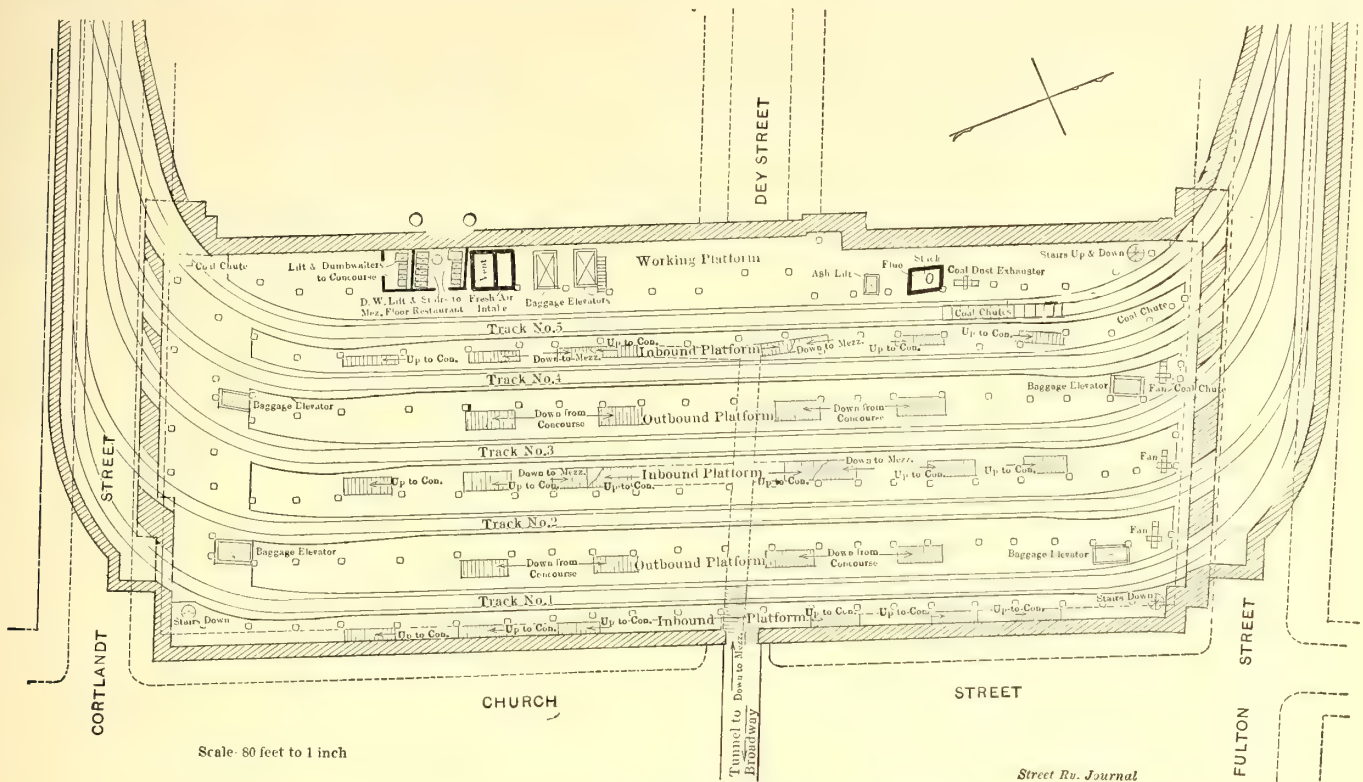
PLAN OF STATION AT CORTLANDT STREET
